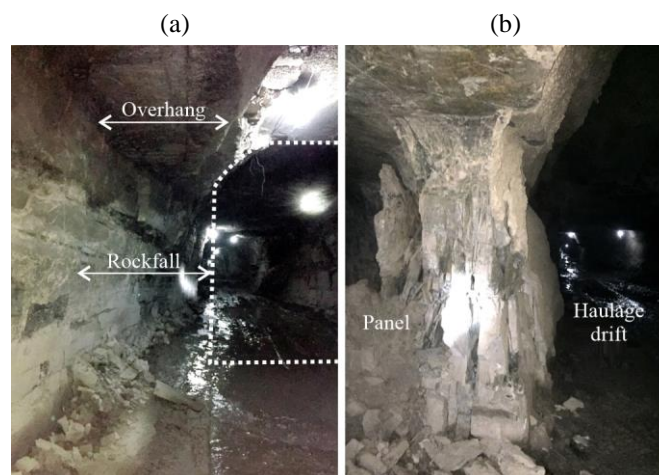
Characteristic forms of destruction: (a) walls of drifts with the formation of a cantilever; (b) the pillar crushing between the drift wall and the stope
